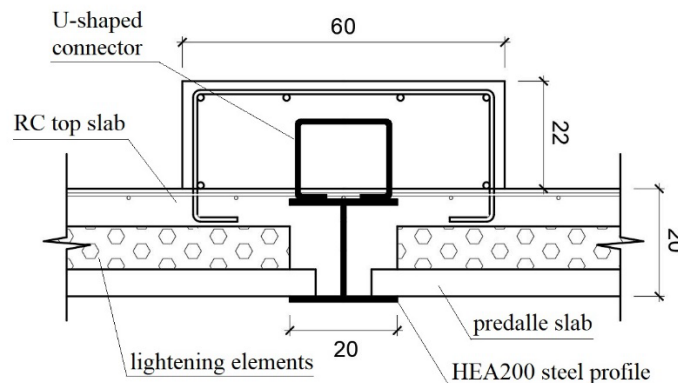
Structural roof section at the top beam (dimensions are in cm).
